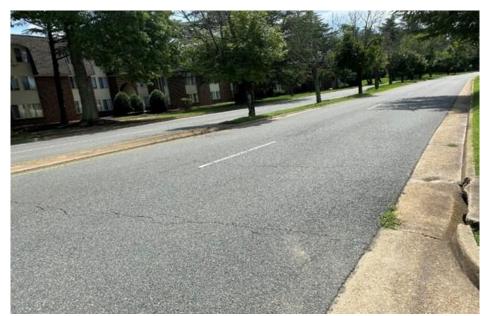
FDR + 2.5-in AC Surface on Stonewall Parkway, 8 Years After Construction. FDR = full depth reclamation; AC = asphalt concrete.
